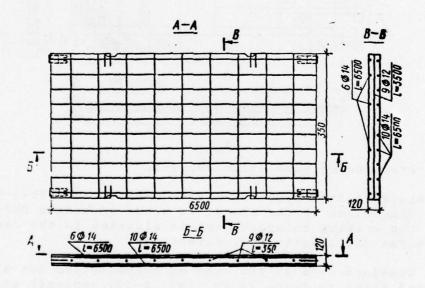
Design of a prestressed reinforced concrete slab, used in experimental construction in Moscow on the Vernadsk Avenue.
